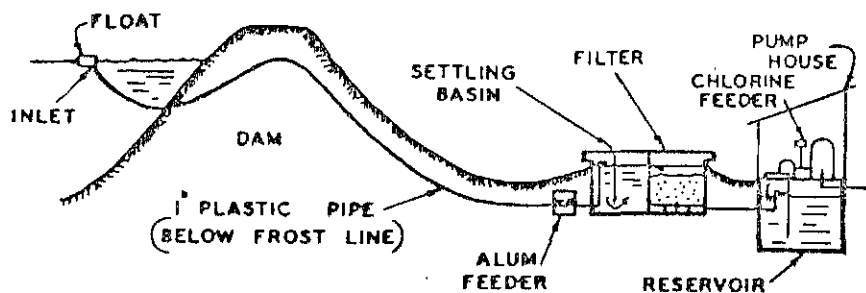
This Plan Shows Treating System Below Level of Pond Dam to Provide Gravity Flow of Water.
